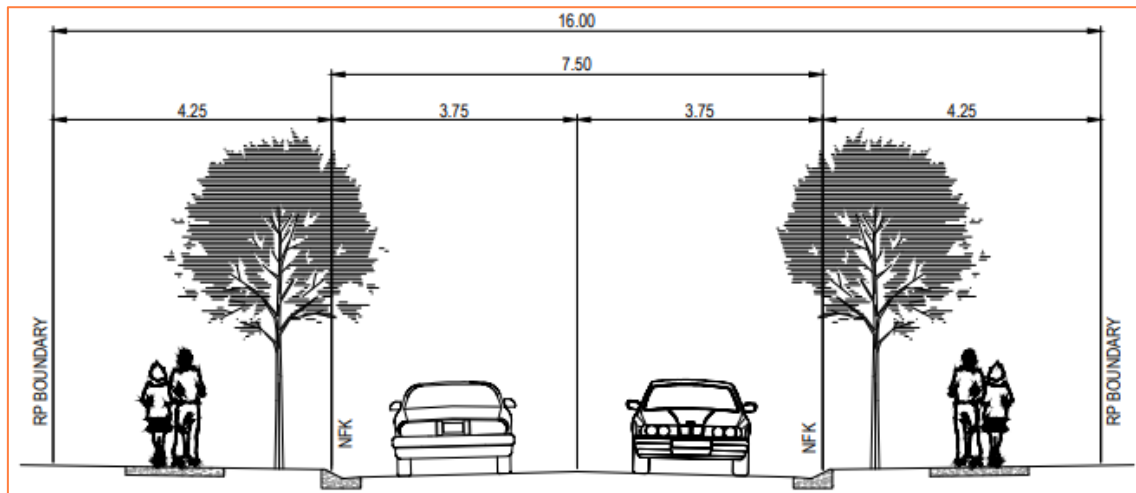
Council Typical Example with No Parking – Neighbourhood Road (City Plan – BSD1021)
